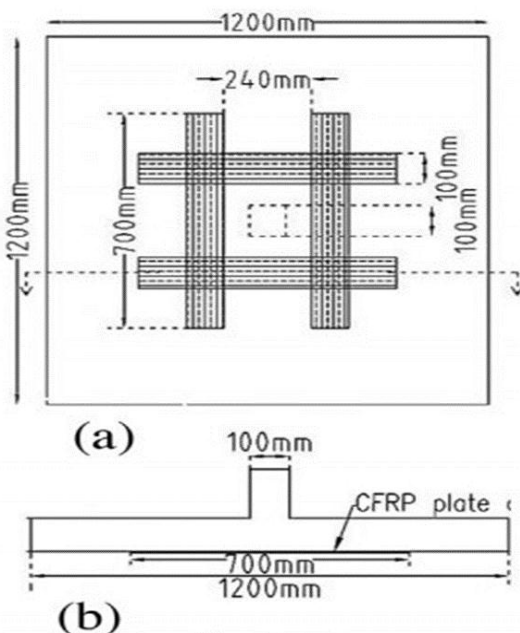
CFRP attached on tension face in orthogonal direction with end anchorage
